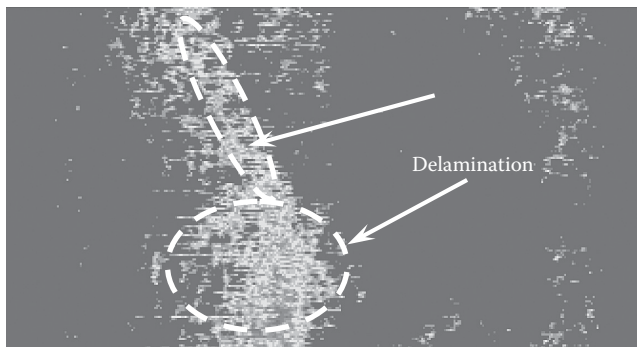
C-scan image of a FRP/Concrete sample showing a delamination inside the FRP and a crack in the concrete below the FRP wrap.
